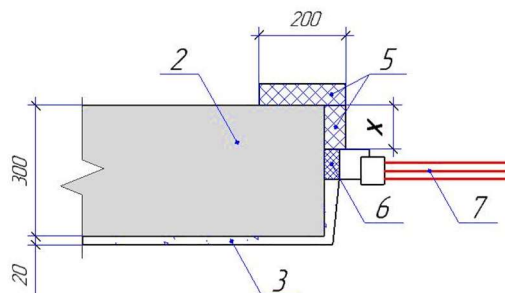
The junction of a metal-plastic window to a precast concrete wall with additional local insulation of a facade
